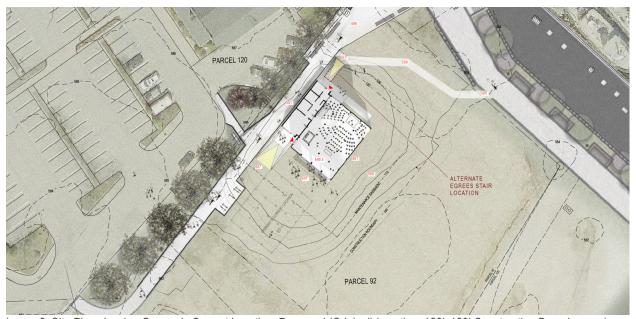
Site Plan showing Granary's Current Location, Proposed (Original) Location, 120'x160' Construction Boundary and 100' x 110' Maintenance Easement (note that grading is preliminary)
